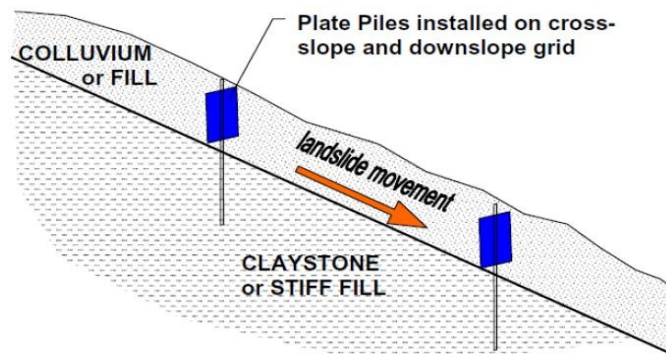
Stabilization of Slope using plate pile (McCormick and Short, 2006).
